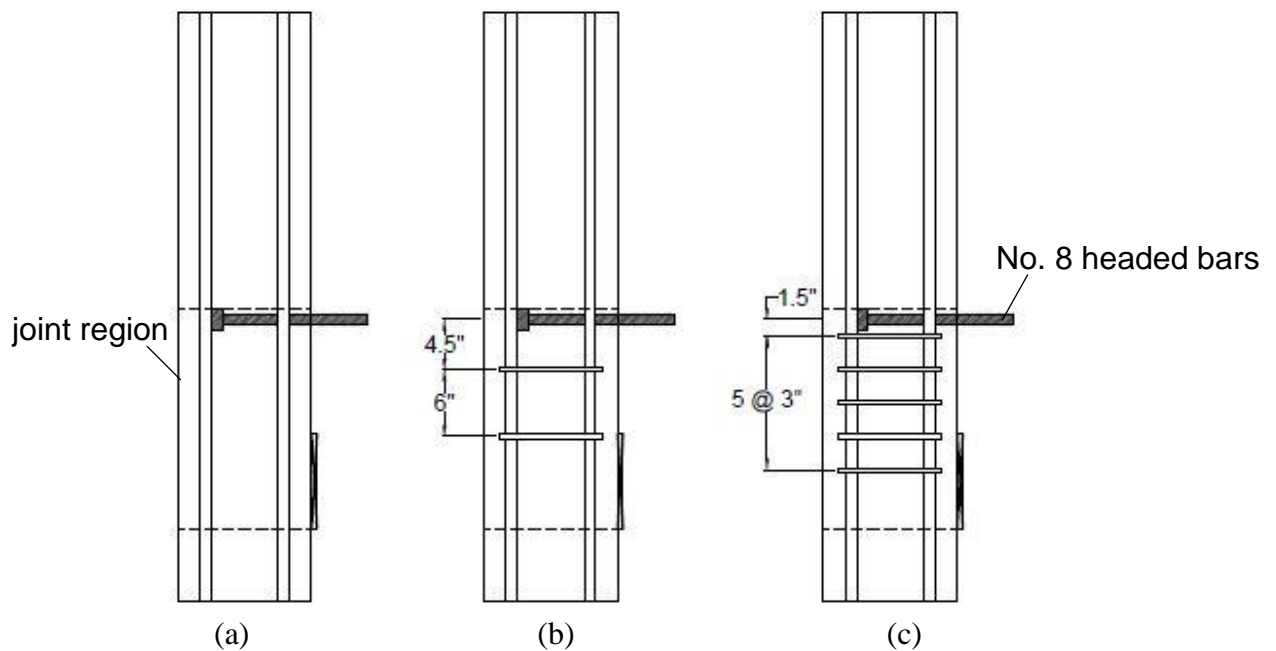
Confining reinforcement for No. 8 headed-bar specimens (a) no confining reinforcement, (b) two No. 3 hoops, (c) five No. 3 hoops
